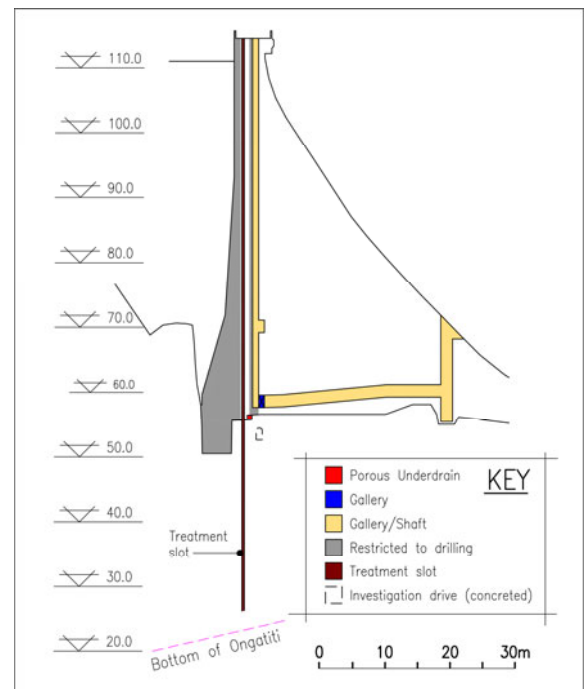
Typical cross section of dam at a contraction joint showing cutoff location and relationship with shafts, gallery and underdrain.
